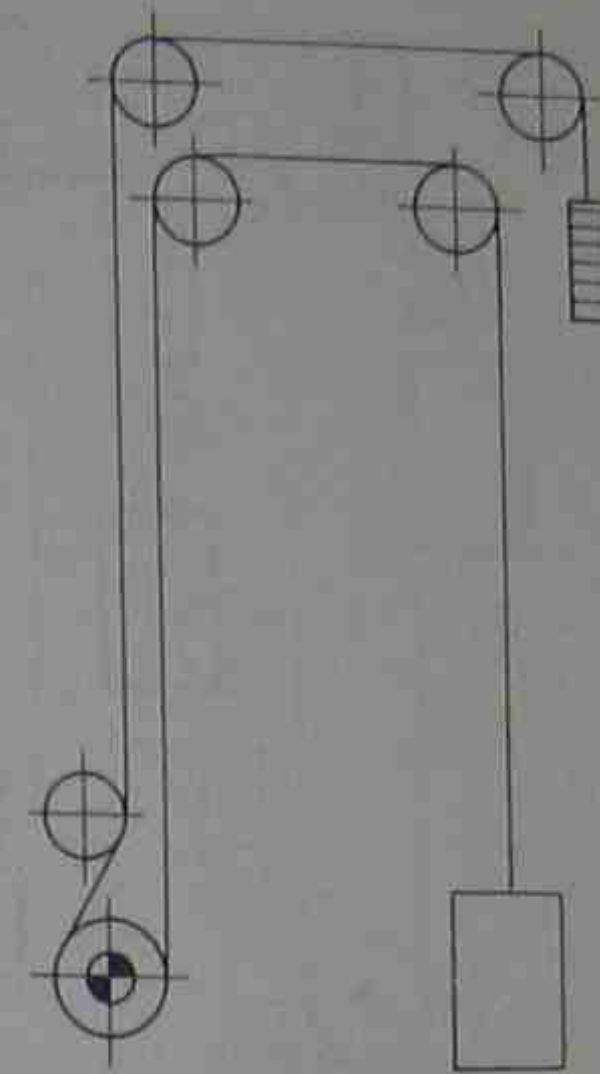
Roping system for basement position of the machine, single wrap drive, roping factor 1.
